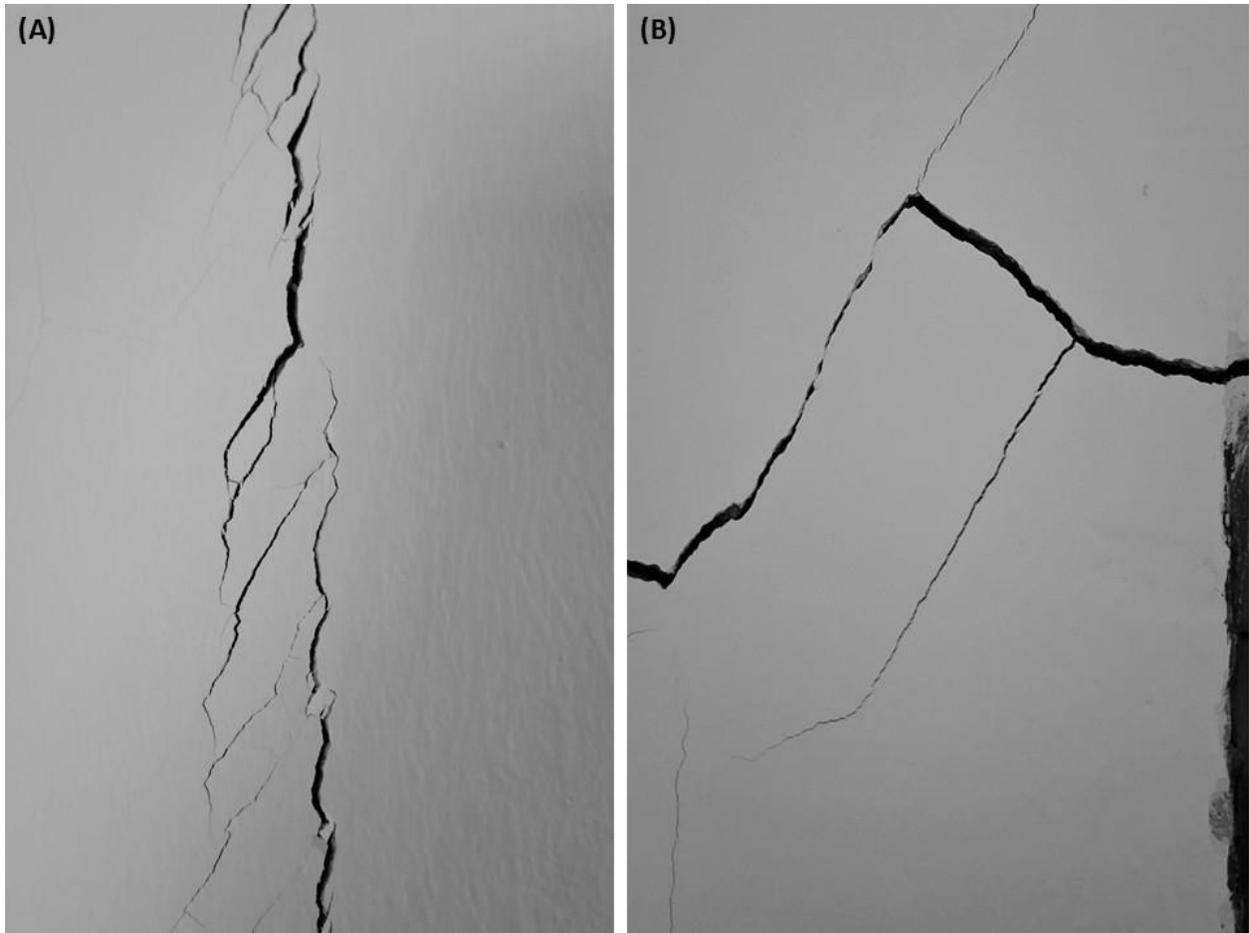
Examples of cracks in building surfaces: (A) Vertical cracking pattern on a wall surface, indicative of potential structural stress or material degradation. (B) Horizontal and diagonal cracking likely result from differential movement or environmental influences such as moisture ingress or temperature variation. These images underscore the importance of thorough assessment and repair strategies to maintain building integrity. The photographic examples illustrate common surface patterns, but Figure 1 is intended only as a visual aid; diagnosis should prioritise mechanism-based classification (see Table 1).
